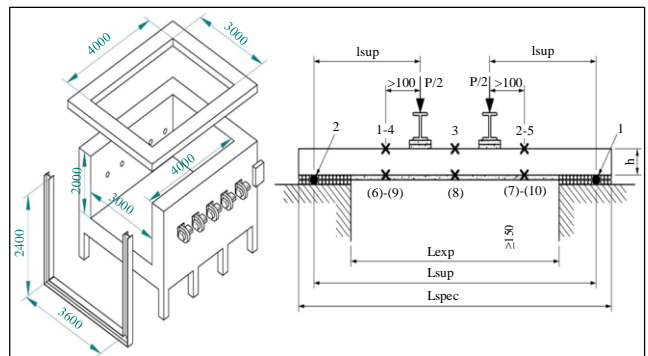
Horizontal furnace drawing (left) and testing configuration drawing [24] (right)
